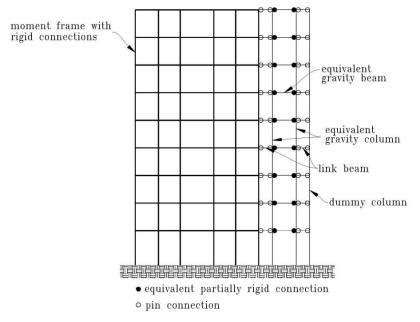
Elevation of two-dimensional model of building with equivalent gravity framing and dummy columns
